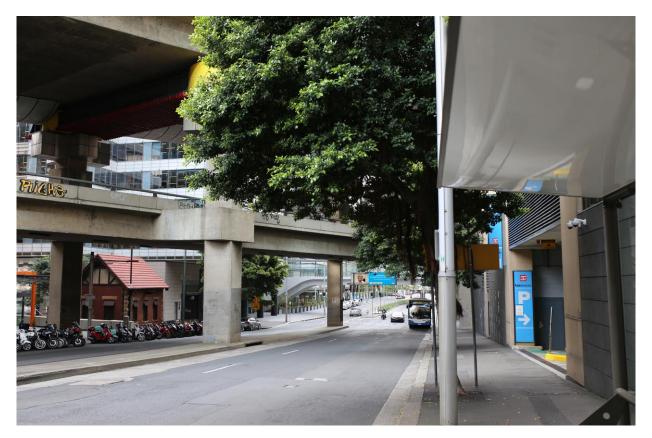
Viewpoint 4 (Sussex Street eastern footpath looking north) Source: Ethos Urban (2021)
